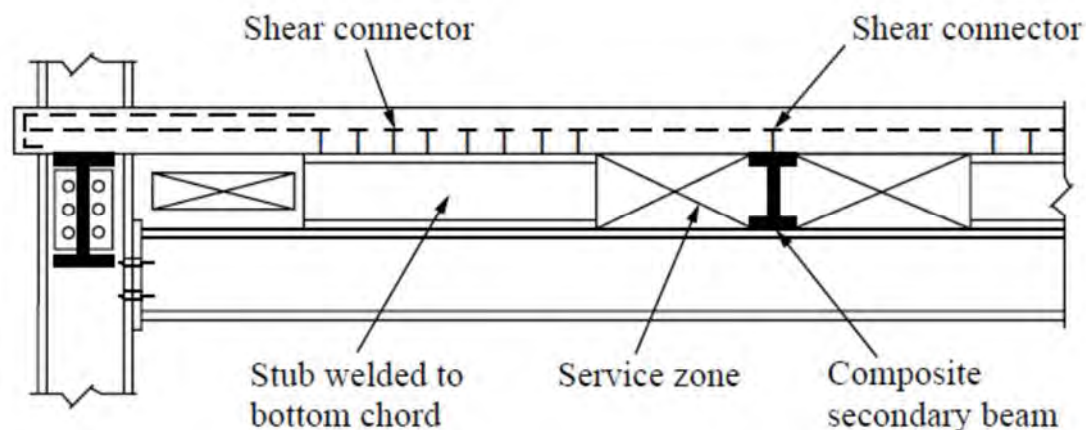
Stub Girder System (Uy and Liew 2002).
